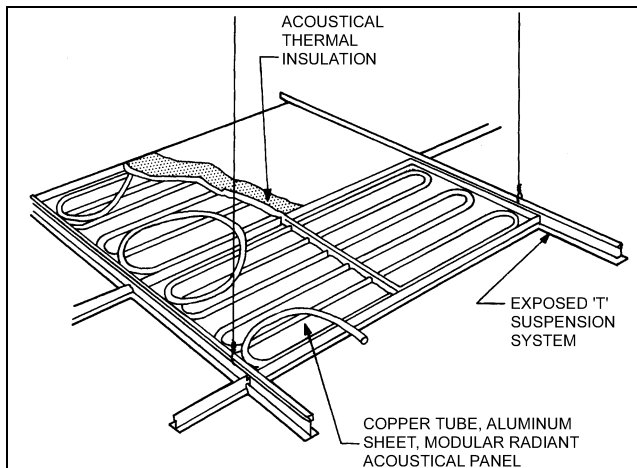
Metal Ceiling Panels Bonded to Copper Tubing
